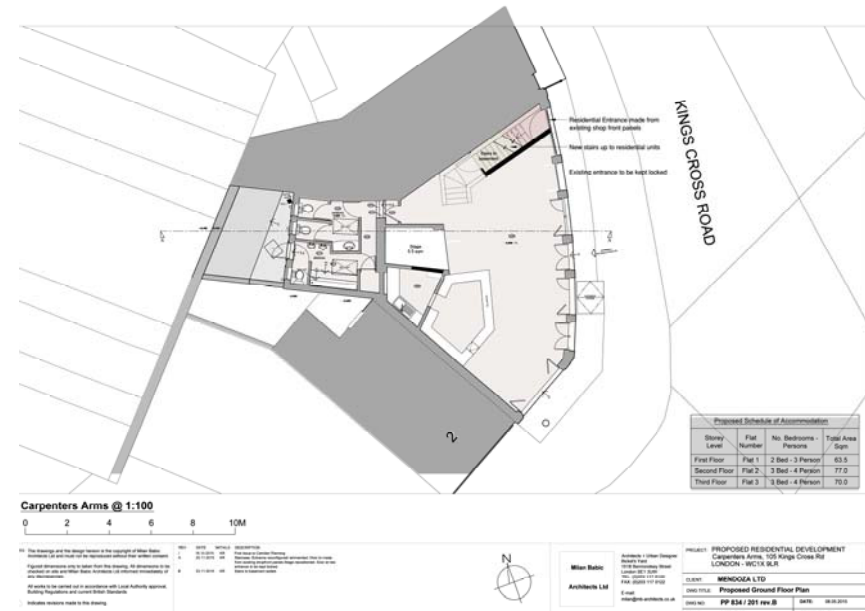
Proposed Ground Floor Plan – (New walls shown in Black)
